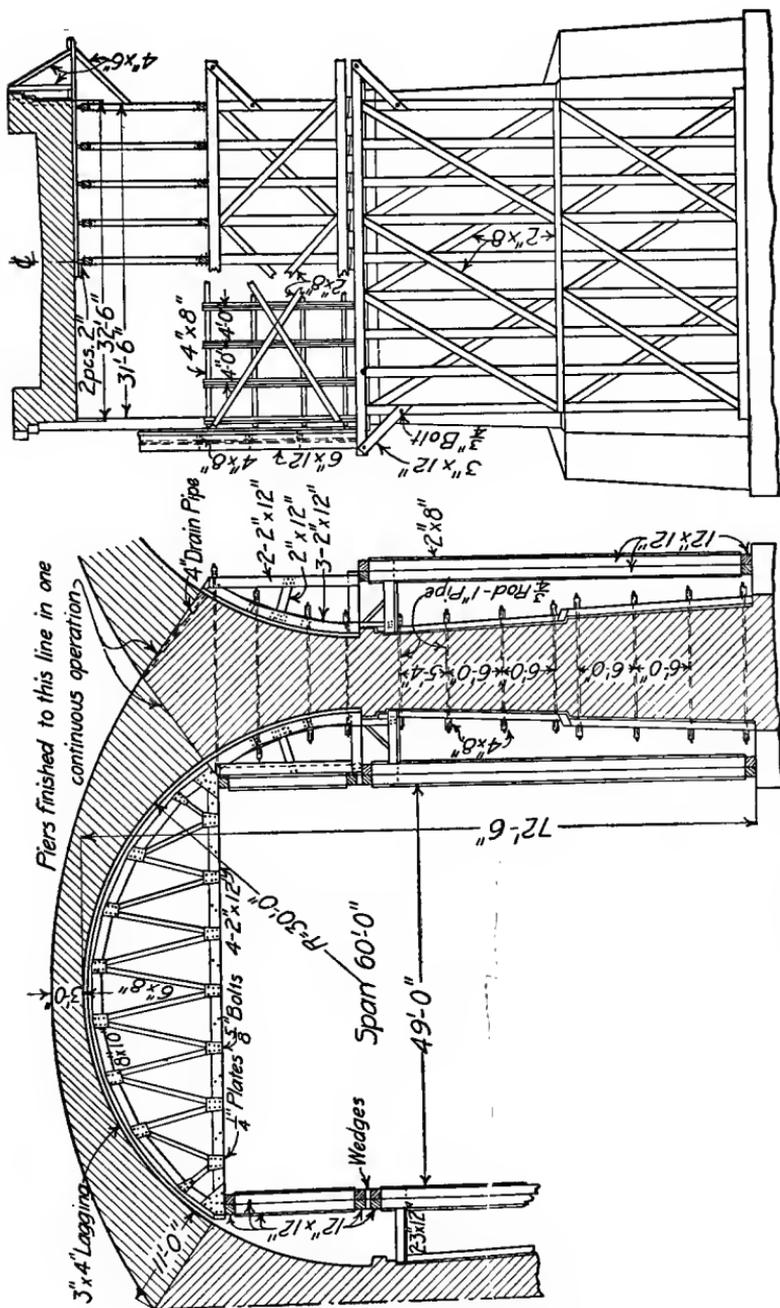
PENNYPACKER BRIDGE, PHILADELPHIA AND READING R.R.
